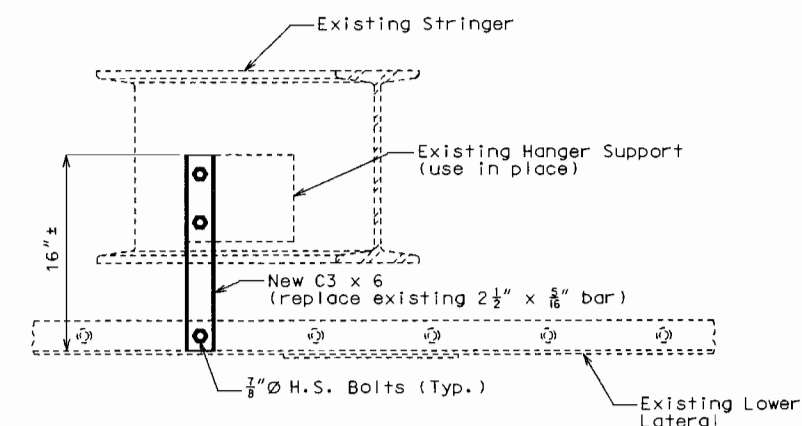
DETAIL SHOWING DAMAGED SWAY BRACING MEMBER REPLACEMENT IN TRUSS SPANS
